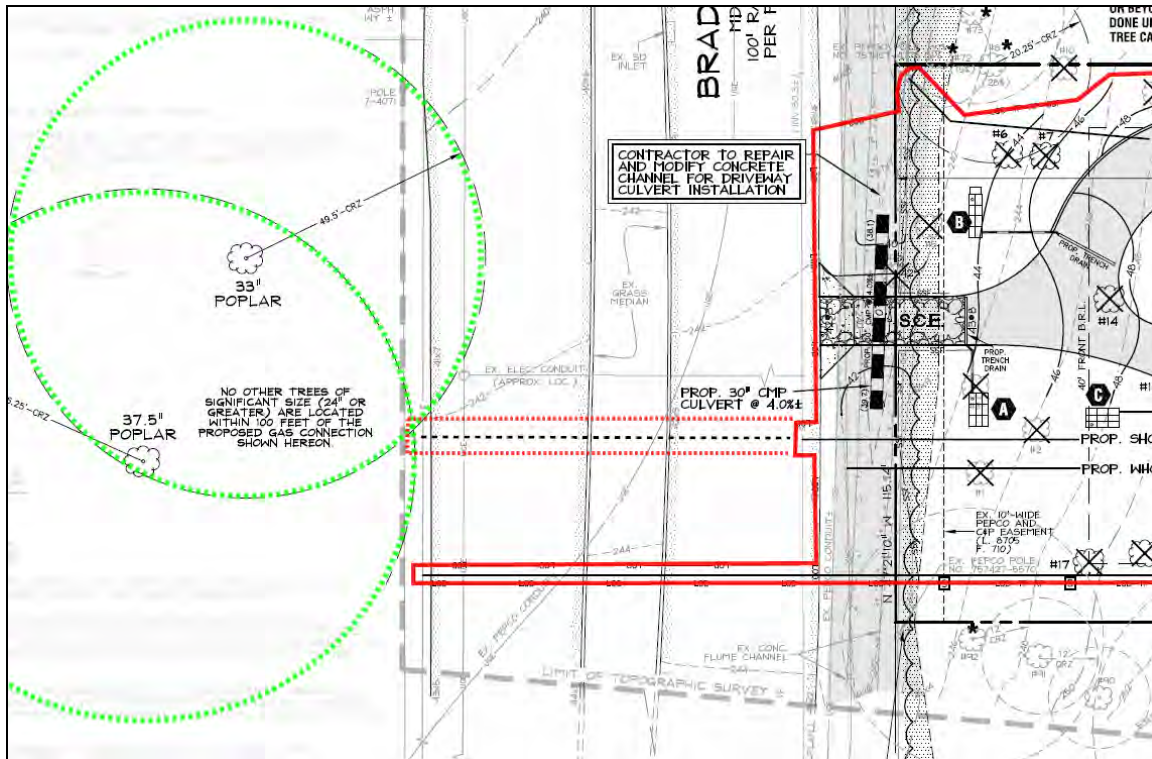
Possible minor impacts to offsite trees on opposite side of Bradley Boulevard
